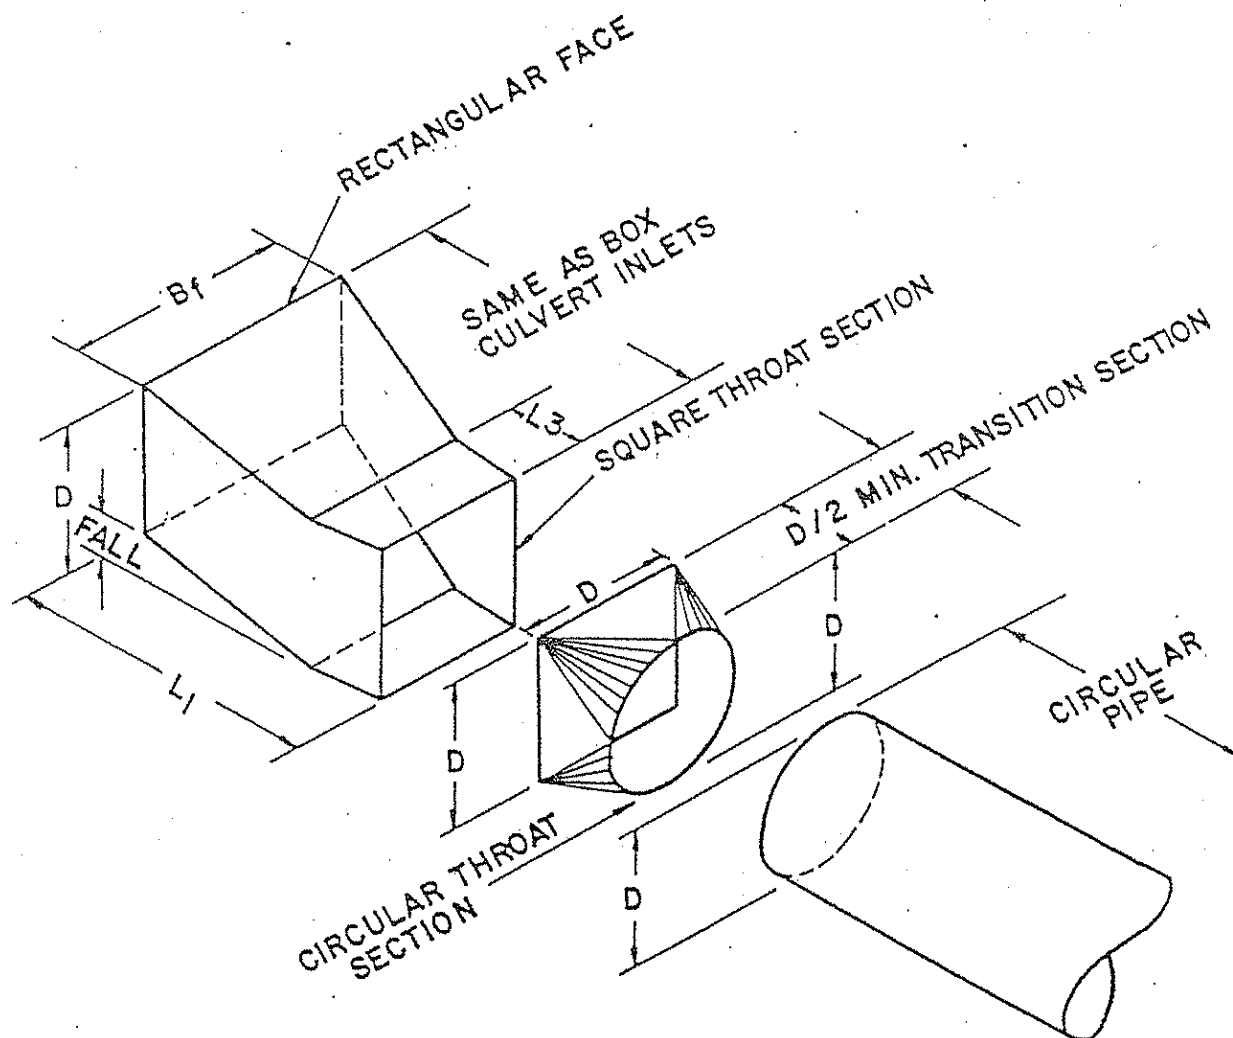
Slope-tapered inlet, circular pipe culvert.
